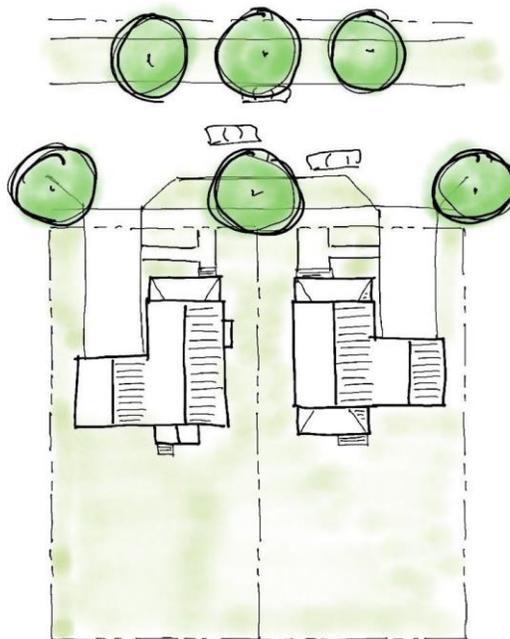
Single-Family Detached Front Loaded, Representative Architecture & Plan
